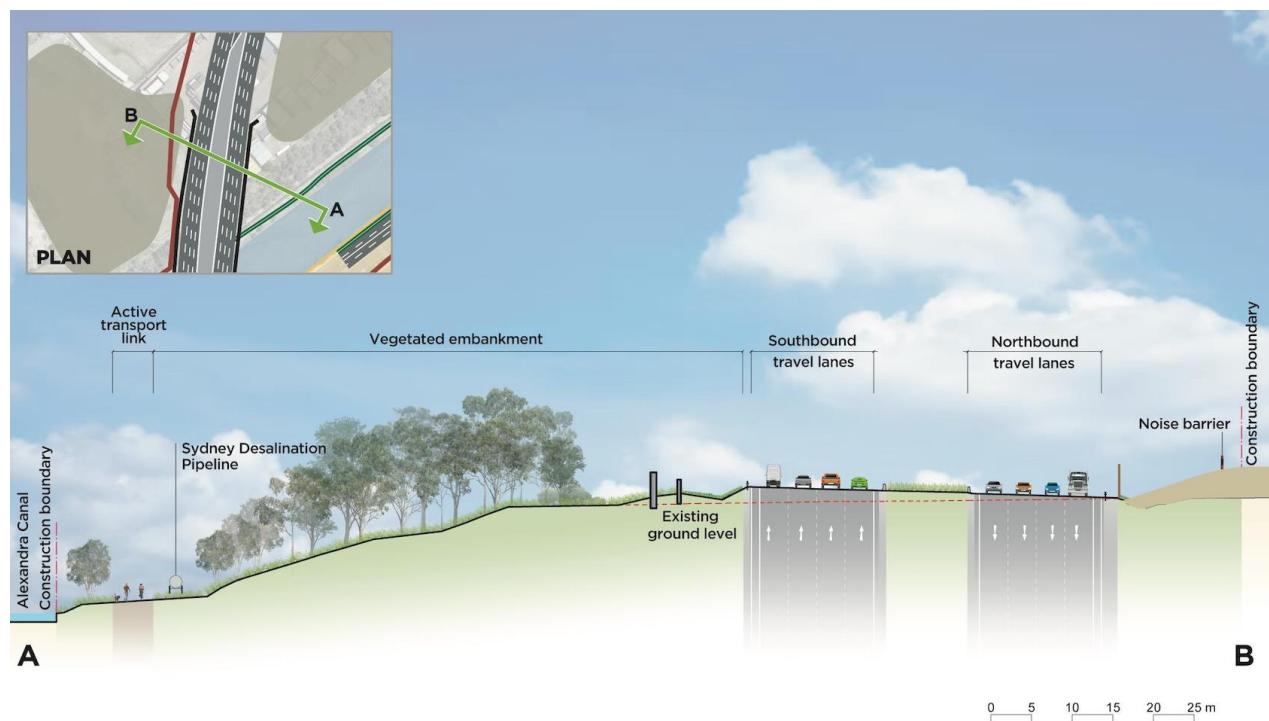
Terminal 1 connection – typical cross-section (looking south)
